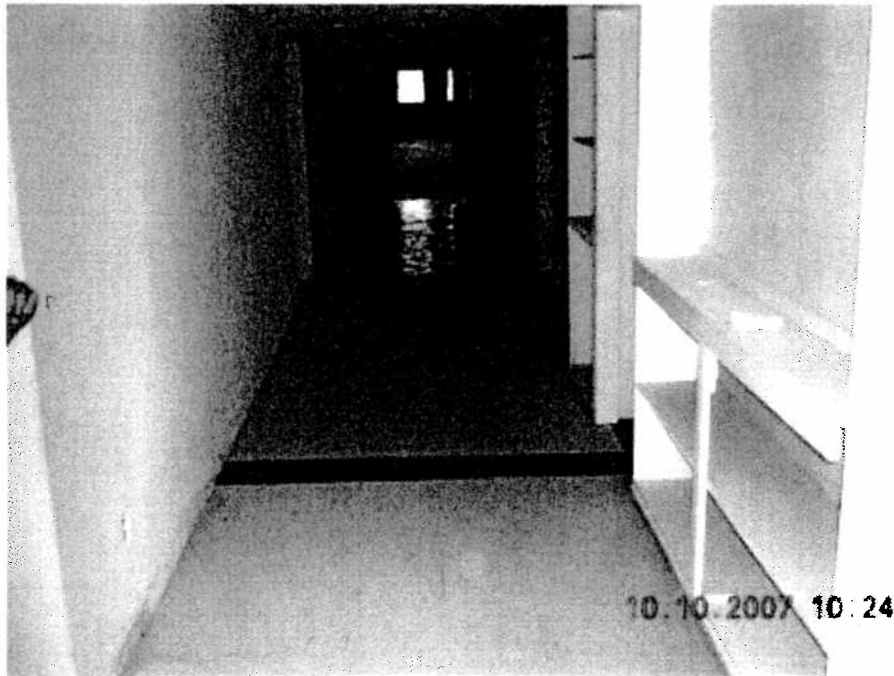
View from the main entrance looking north thru the hallway to the drill floor in the background.
